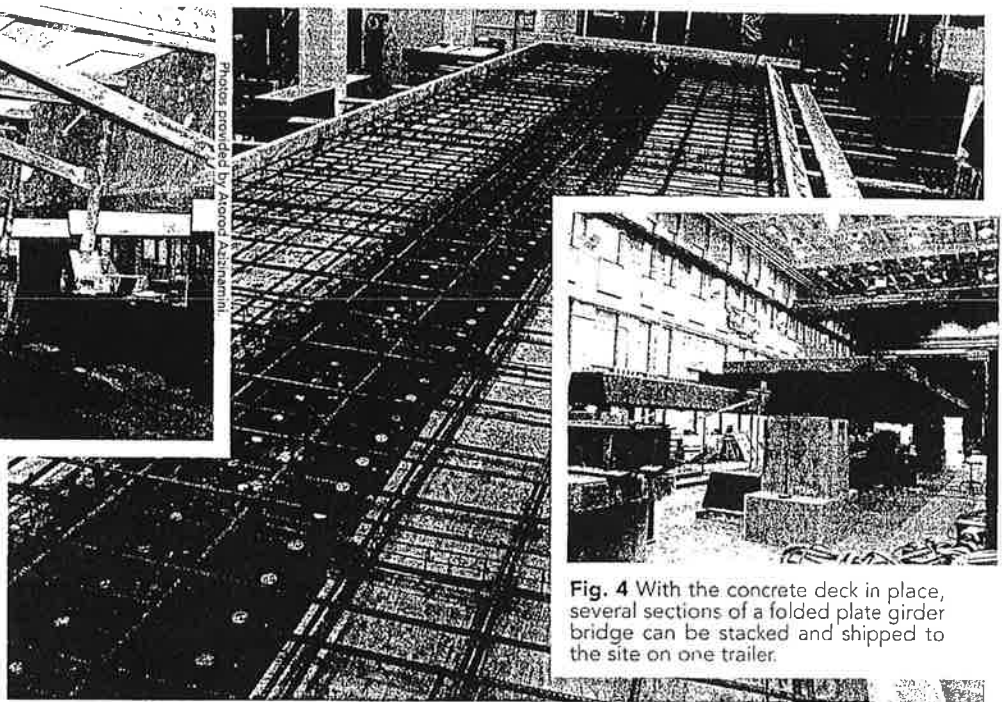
A folded plate girder with deck forms and reinforcing steel in place. Note the studs on the girder and the sizable work platform it provides.
